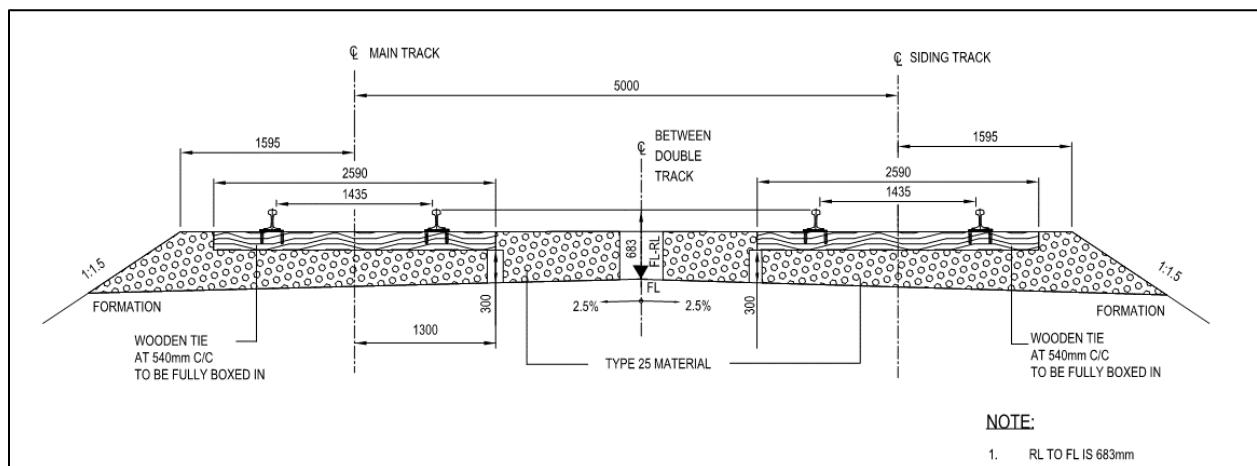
Typical Cross Section – Double Track in Sidings – Superstructure
